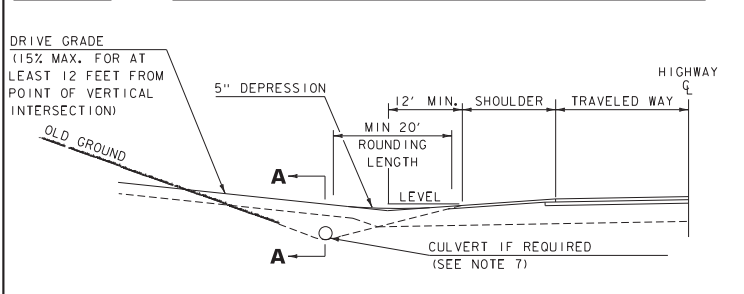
DETAIL C PROFILE OF DRIVE INTERSECTION (FILL SECTION)
